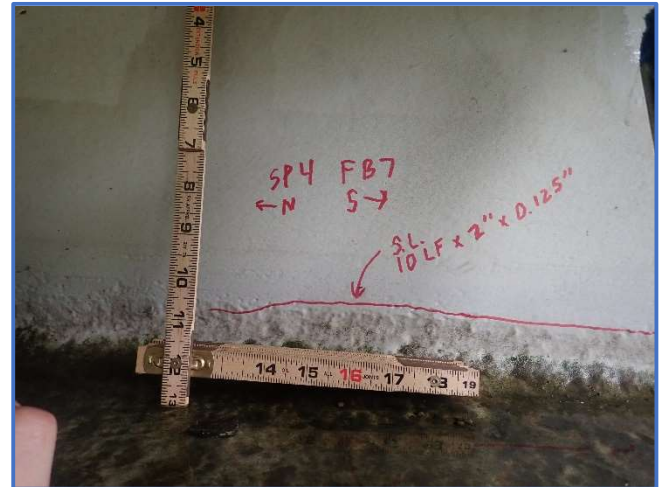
Pitting along bottom edge of Floorbeam 7 web west face, Span 4, at Stringer 5, looking east
